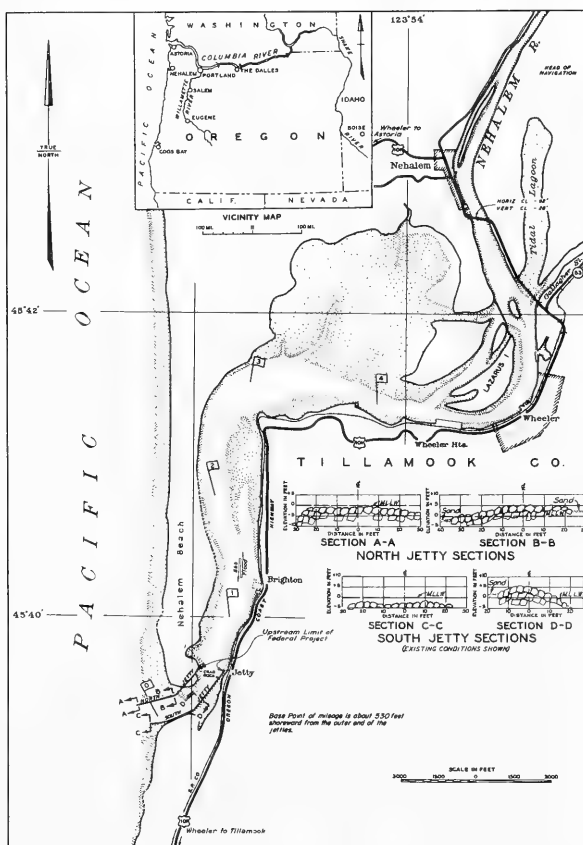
Site layout of Nehalem Bay, Oregon (revised 1979)
